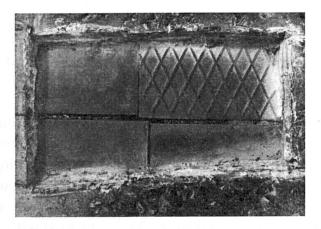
Deck Plate on the Smooth and Chequered Plate Panels After Removing the 11/2-in. Surfacing. Rusting Can Be Seen Round the Edge of the Plates.
